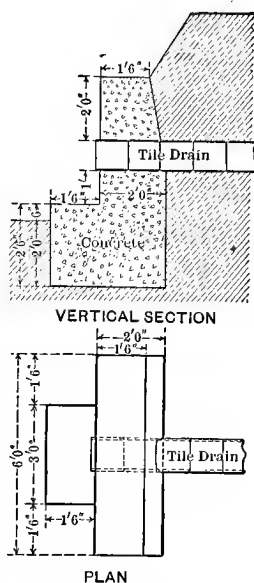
PLAN FOR CONCRETE OUTLET PROTECTION.
